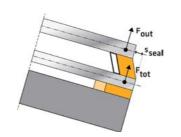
Forces and deformed joints after the frame and the glass are shaped
